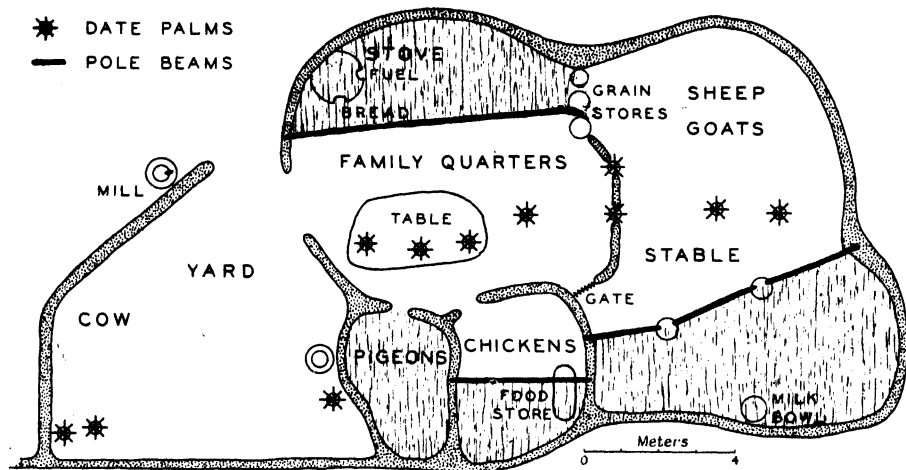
Plan of a typical house in Zeiniya Bahari.
